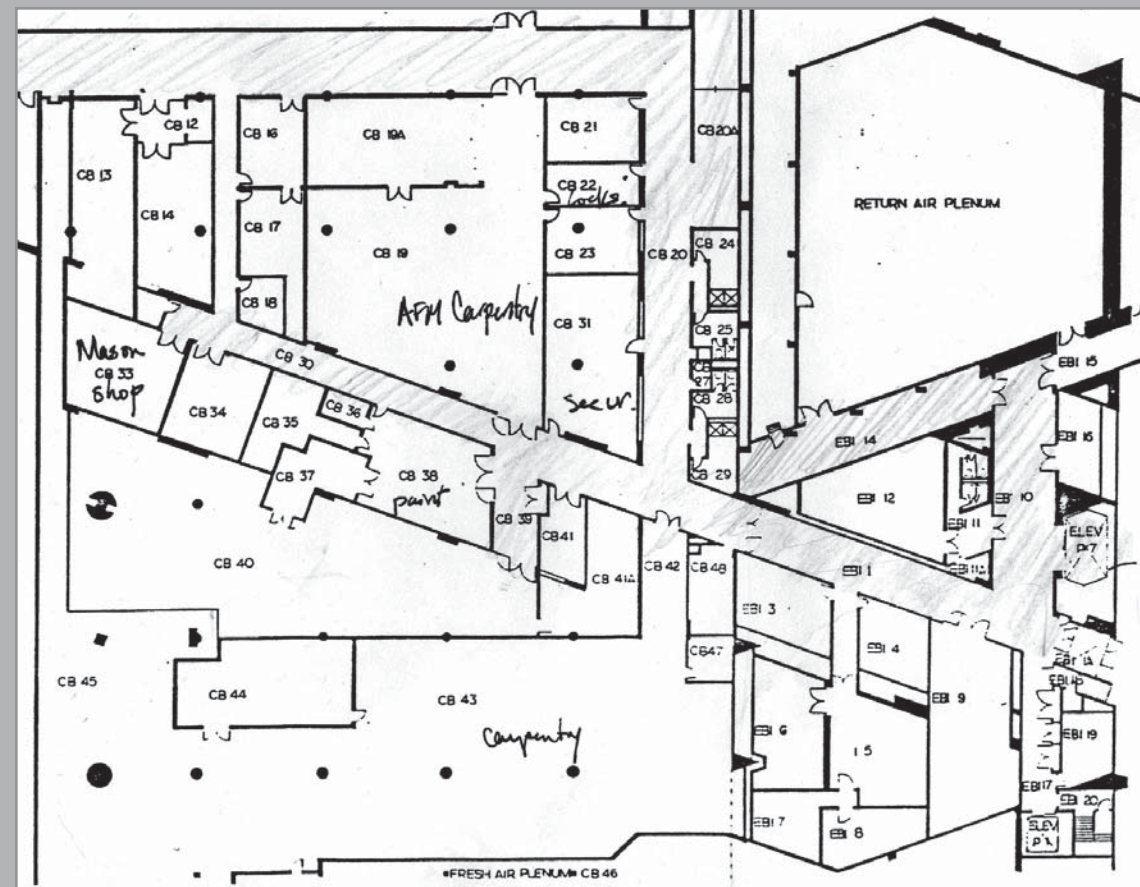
Ground floor plan, East Building, National Gallery of Art, I.M. Pei. Drawing obtained from office of exhibits, NGA.
